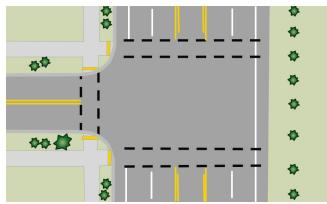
Unmarked Crosswalk Locations where curb ramp and shoulder connect
